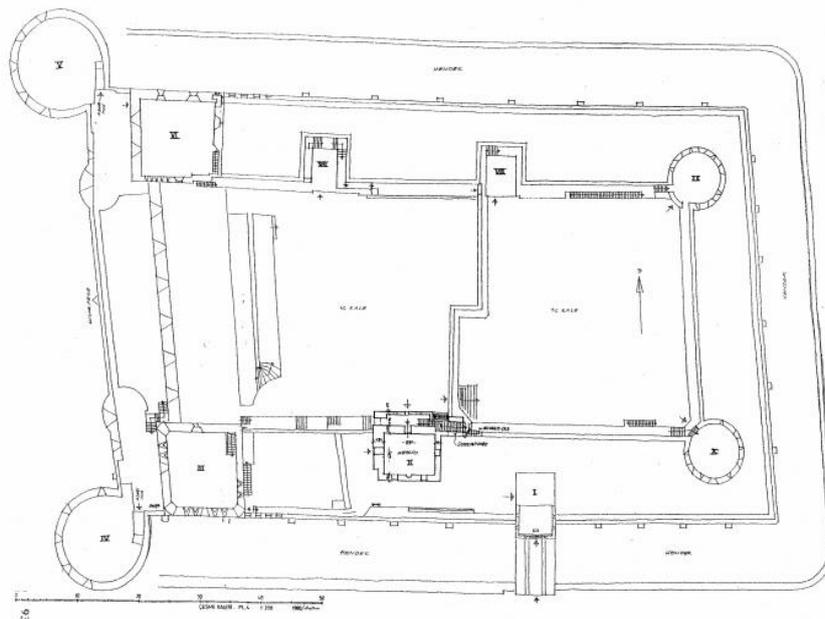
Floor plan of Çeşme Castle (Öztürker, 2011, p. 314)
